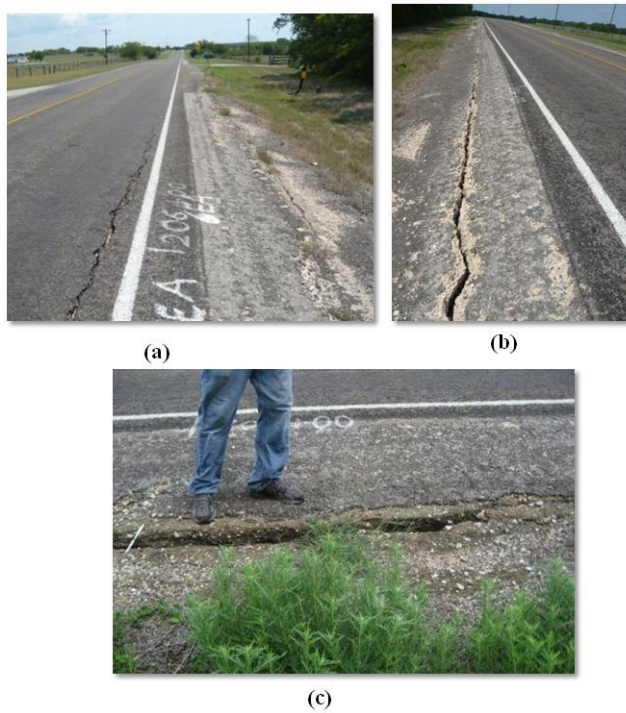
Continuous cracks through three section due to steep slope on east side of the pavement; (a) 6Ea (b) 7Ea, (c) 8Ea
